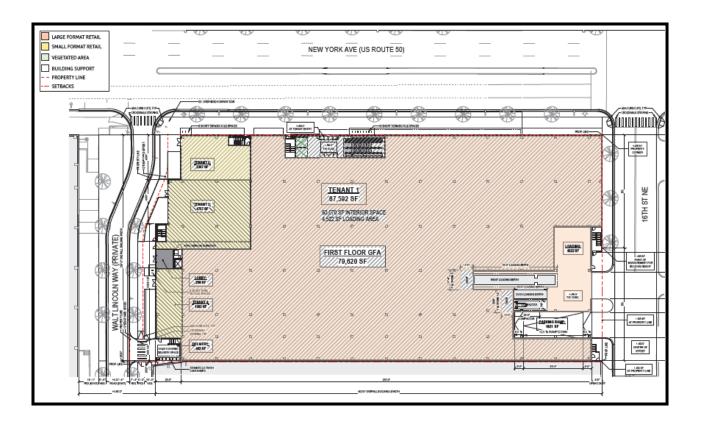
Proposed First Floor Plan (*Provided by Applicant*)
